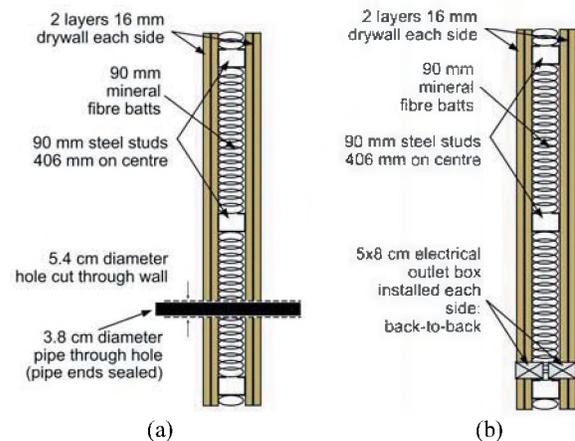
Wall configurations: (a) sealed pipe passed through wall, (b) back-to-back electrical boxes.
